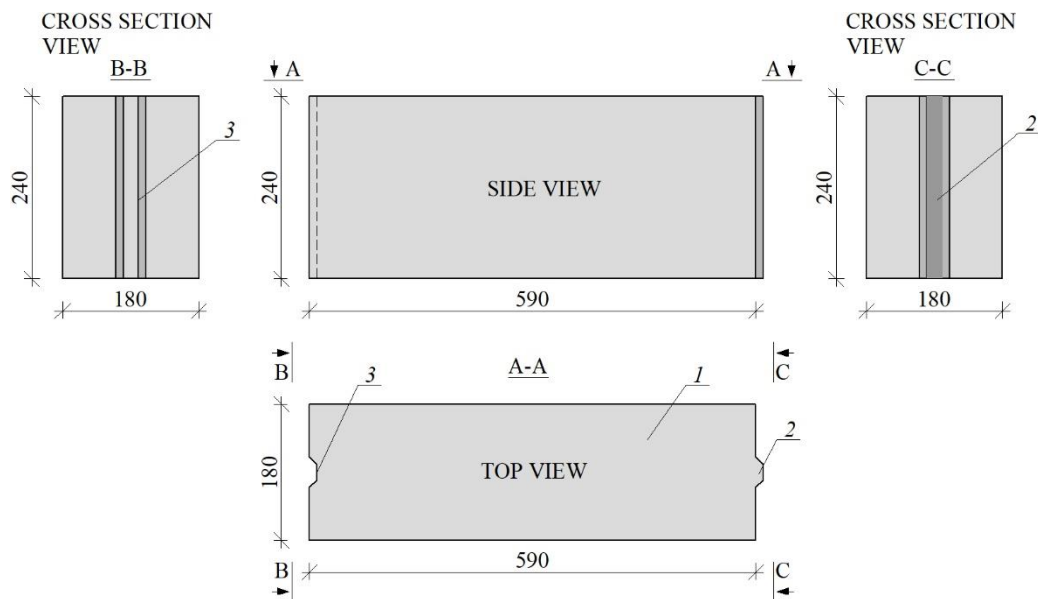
Geometry of a single masonry unit used in the tests: 1 – masonry unit, 2 – tongue, 3 – groove
